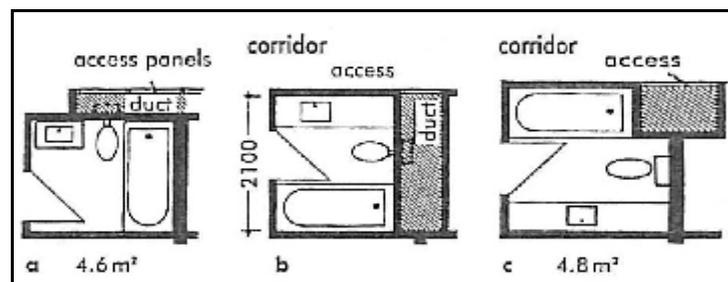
Bathroom vent shaft detailing of a typical guestroom. (PICKARD, 2005, 147).
